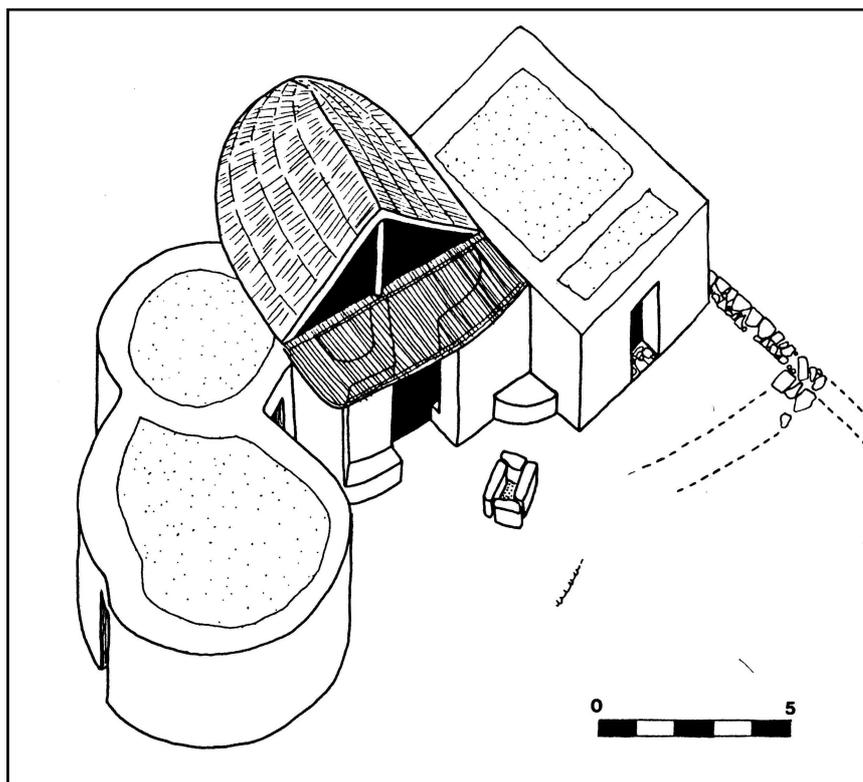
Reconstruction sketch of the Ruler’s Dwelling at Lathouriza.
